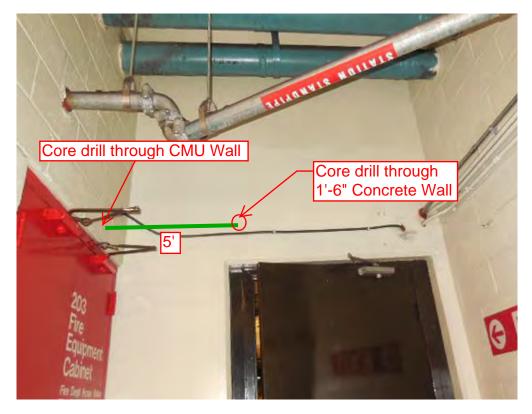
Proposed Conduit Run between Room 201 and Room 203
